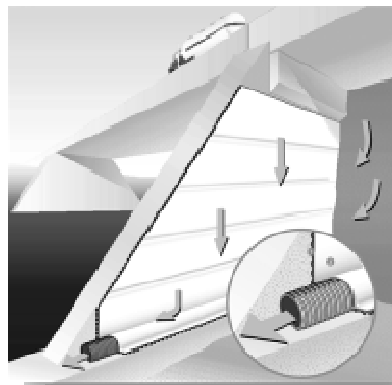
Quick connect system connecting drain mini-pipes to a collector
